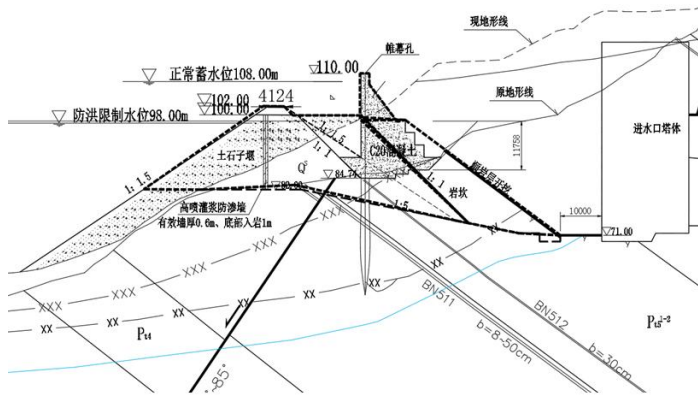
Cross section diagram of reserved rock ridges and concrete cofferdams
